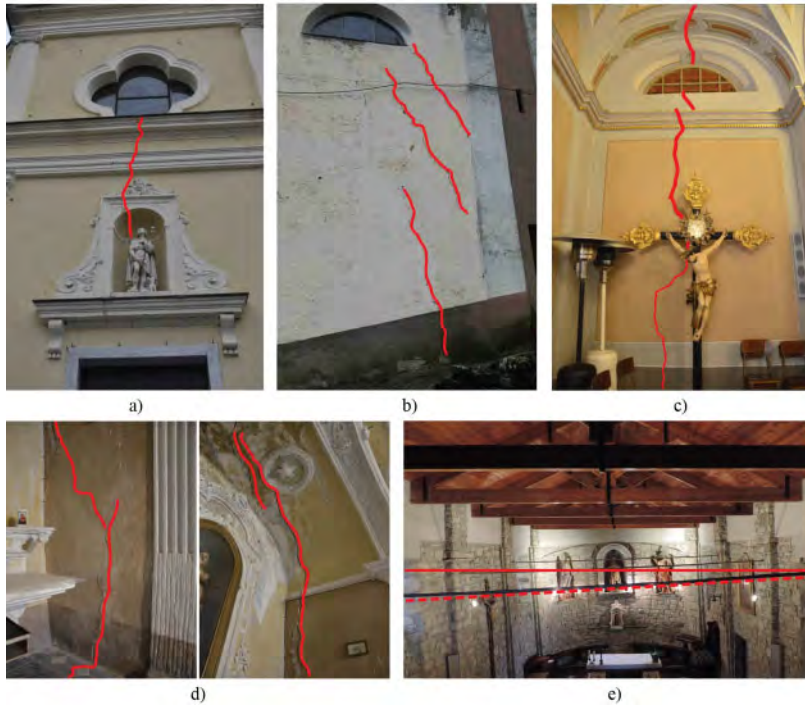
Damage of walls: a) cracks in the façade wall next to openings, b) diagonal cracks in longitudinal walls propagating from the level of the ground, c) vertical cracks increasing in width with height at the middle span of the wall, d) vertical cracks in lateral walls extending from the level of the ground and continuing up into vaults, e) rigid rotation producing out-of-plumbness of longitudinal walls and loss of horizontality of metallic tie-rods.
